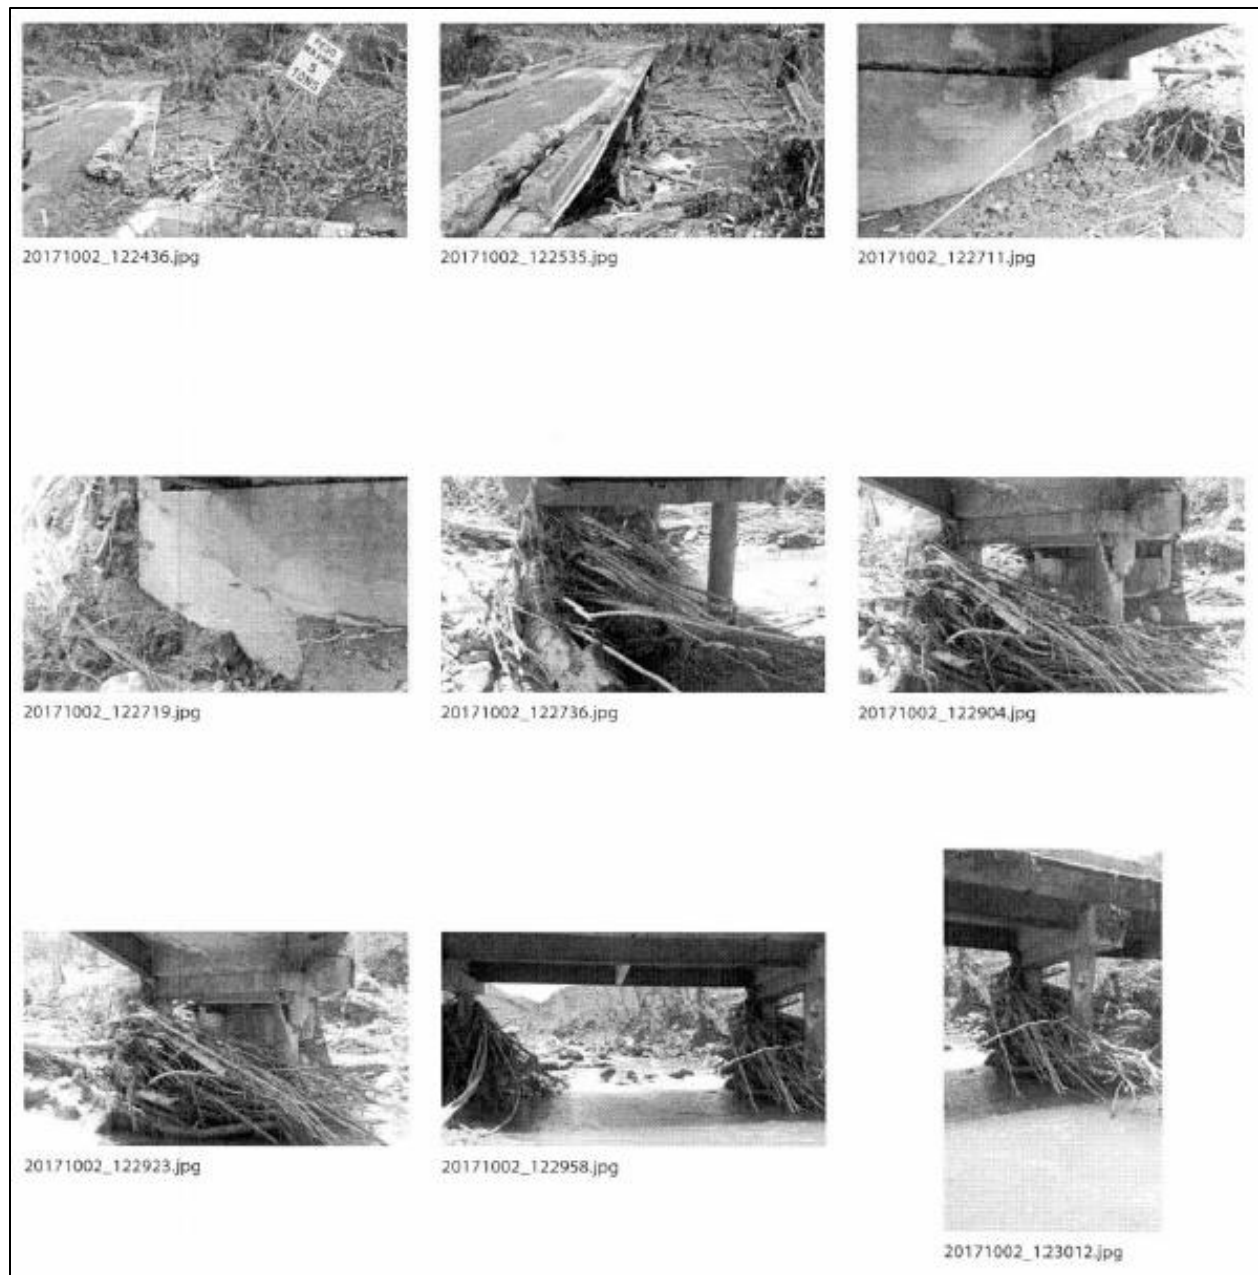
Bridge 2574 photos from October 2, 2017 inspection (source: PRHTA)
